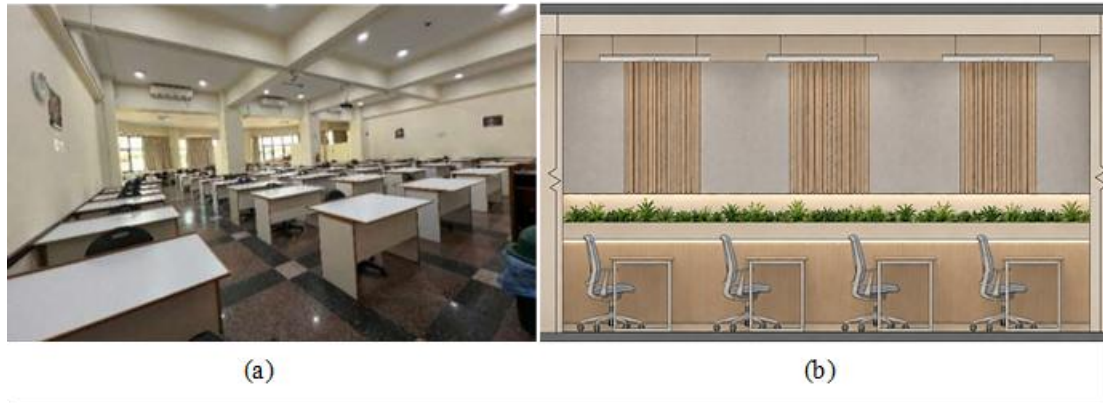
Design studio: (a) existing condition; (b) schematic wall elevation of the proposed treatment (not to scale) showing acoustic fabric and wood-slat panels, built-in planter units with integrated LED lighting, acoustic ceiling grid, and timber-look flooring.
